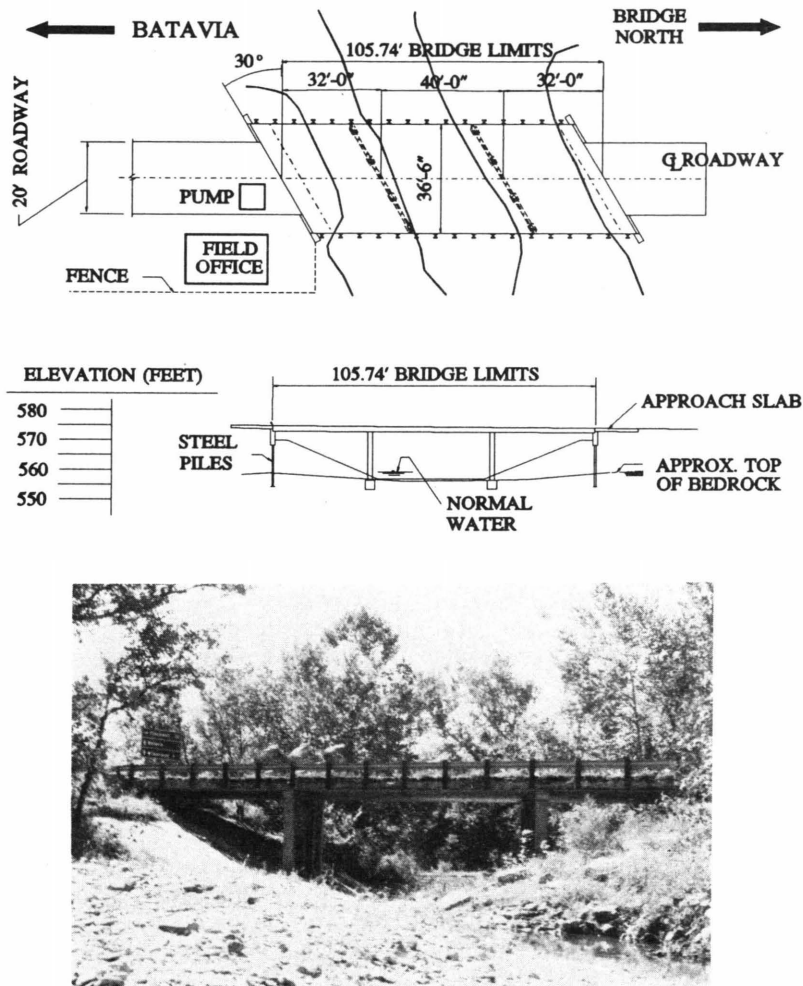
Description of test bridge: *top*, site plan; *middle*, site elevation; *bottom*, photograph.
